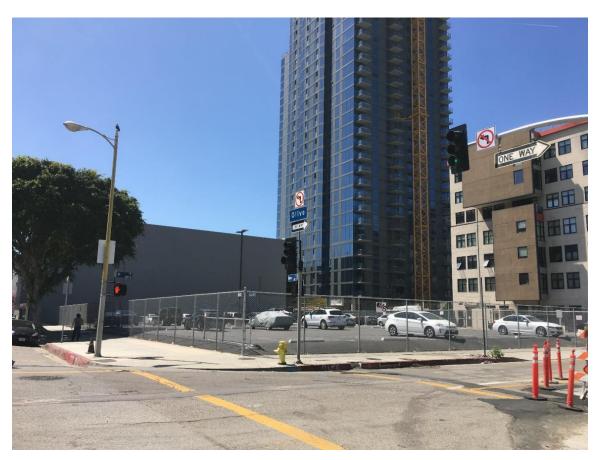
View of the Site from the east corner at the intersection of Olive and 11^{th} St. (Facing west).
